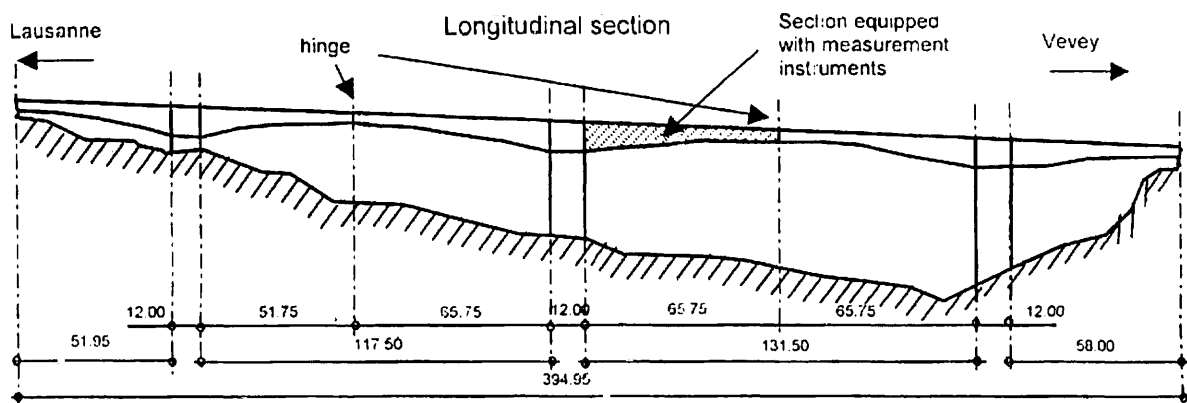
Longitudinal section of Lutrive Bridge (values in meters)
